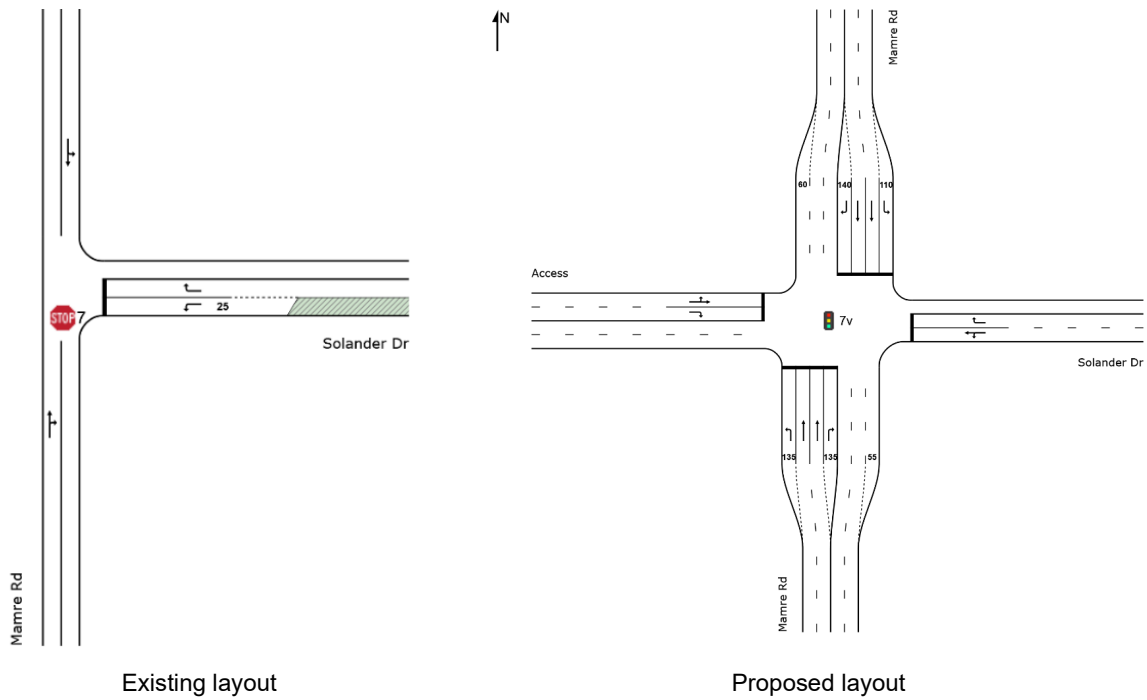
Existing and indicative intersection layout at Solander Drive
